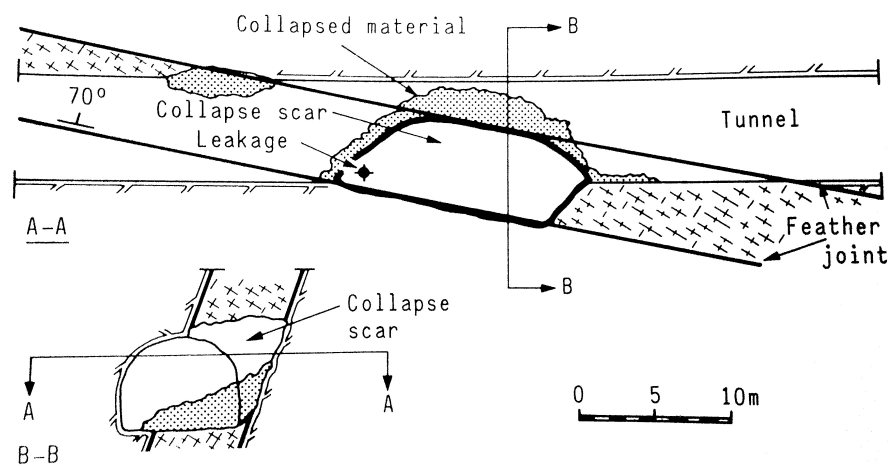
Slide at Tunnsjødal hydropower tunnel caused by smectite [21]
